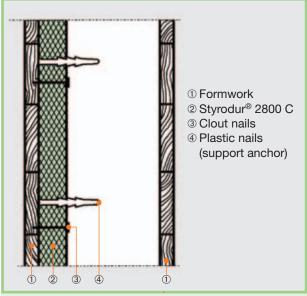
Fixation of Styrodur 2800 C boards to wood formwork with clout nails and support anchors (plastic nails) as mounting to concrete in critical cases.
